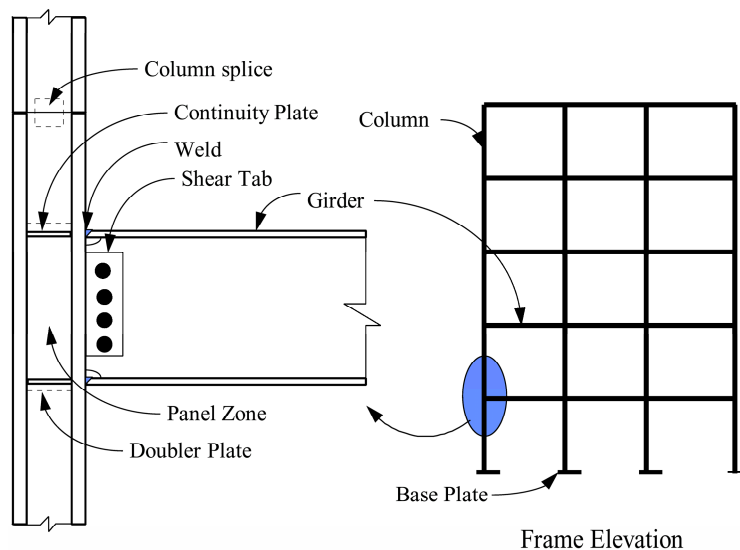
Critical Beam-column Joint Elements of Welded Steel Moment Frame (WSMF)
